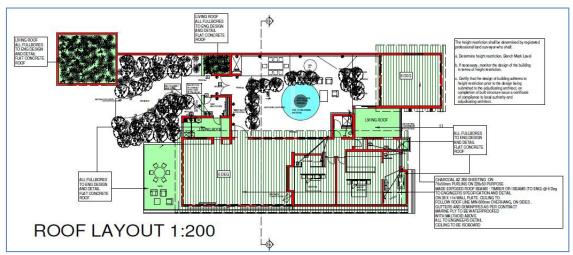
Living Roof Garden - Extract from the Land Use Planning Report by Marlize de Bruyn Planning Consulting Town & Regional Planning and the below also extracted from this report.
